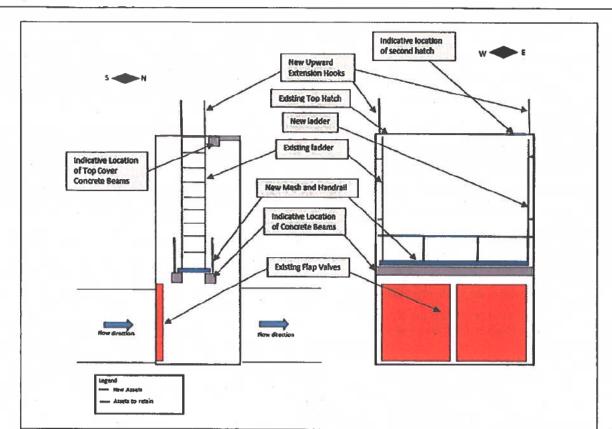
Pevensey West Outfall - Outer chamber (Open Channel). Conceptual arrangement sketch (cross section and elevation)
